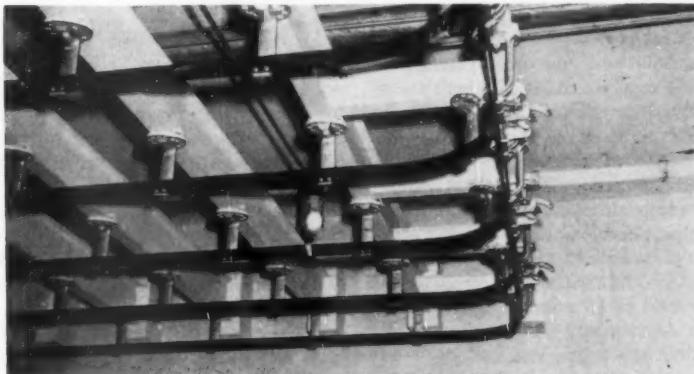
Each of two chill rooms is lighted by eight incandescent lamps spaced around the ceiling among conveyor rails. Each lamp is housed in a weathertight, clear glass enclosing fixture, mounted on the ceiling and fed by rigid conduit.
